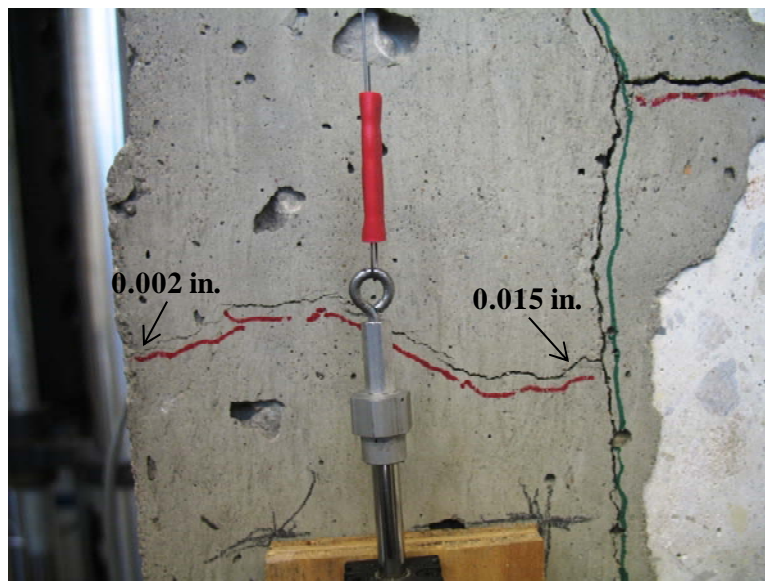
First Crack at Surface of Saw-Cut Specimen
